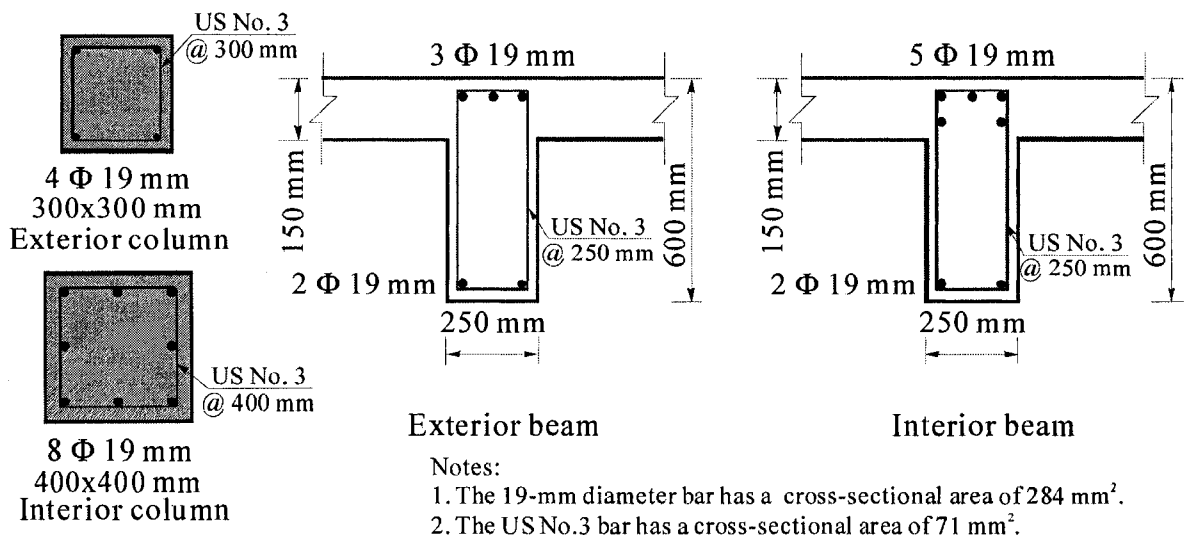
Details of columns and beams for design example 2 (adapted from Abou-Elfath and Ghobarah 2000)
